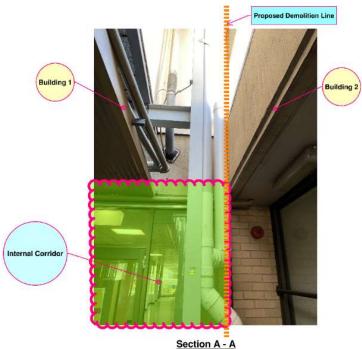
D - Connection Corridor Between Pathology Buildings
